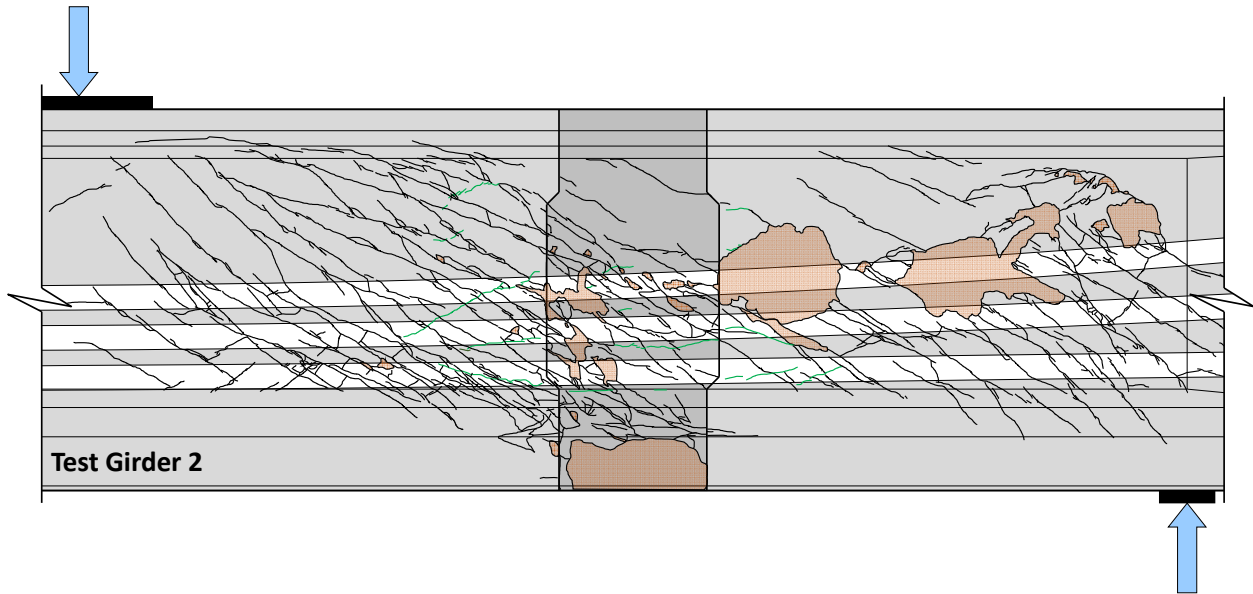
Crack pattern after failure – Test Girder 2
